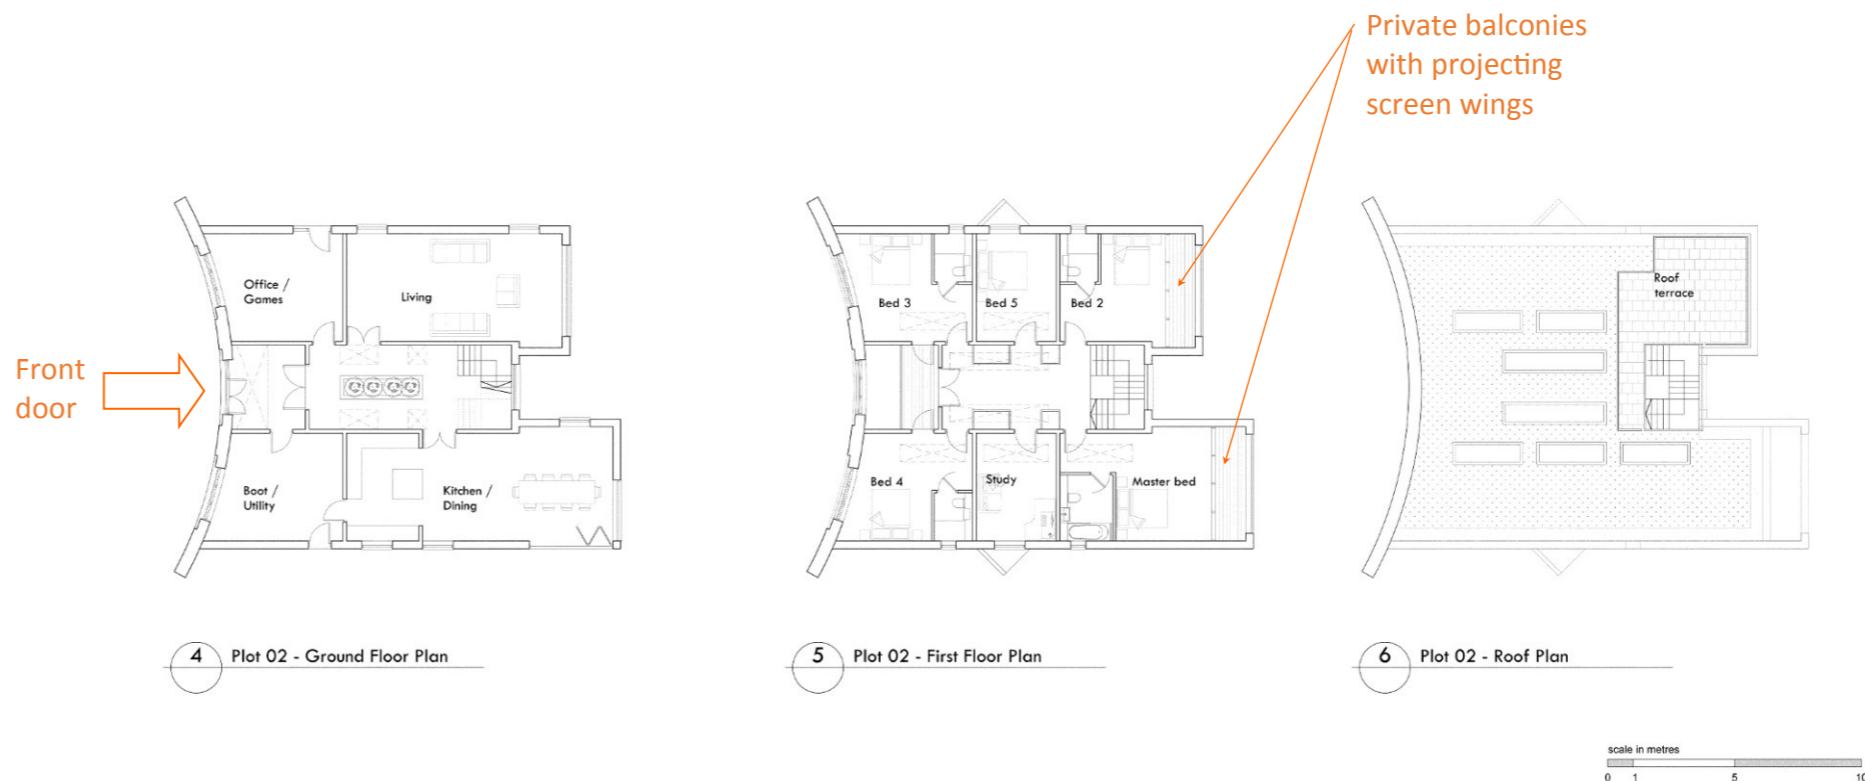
Proposed floor plans of typical dwelling (nts); refer to drawings 2150/115 and 116
